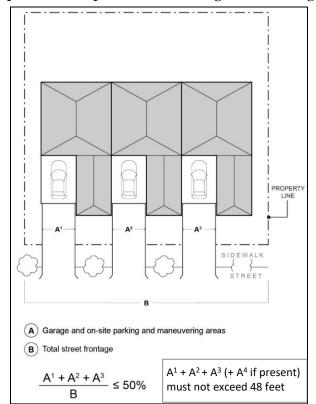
Triplex and Fourplex: Width of Garages and Parking Areas
